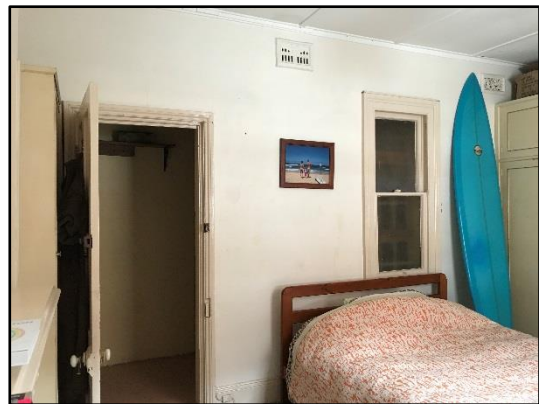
View of ground floor main bedroom. Note early external doorway and infilled window.
